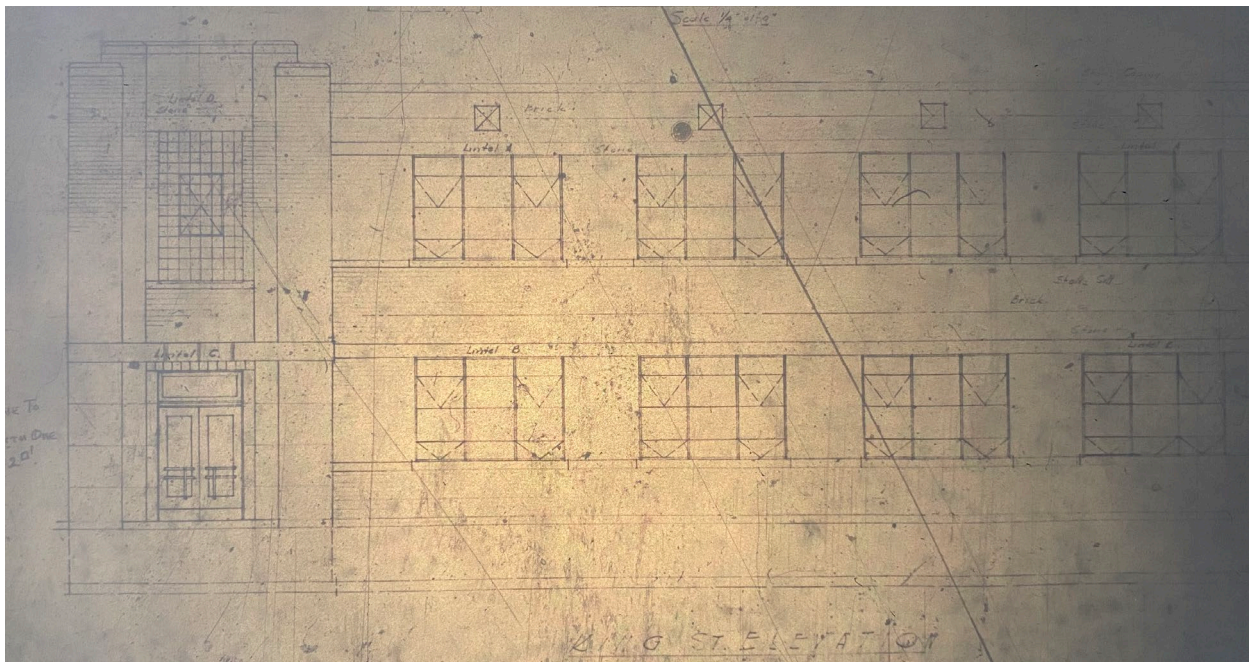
Primary elevation (south, facing King Street West) of the subject property, 1946.
